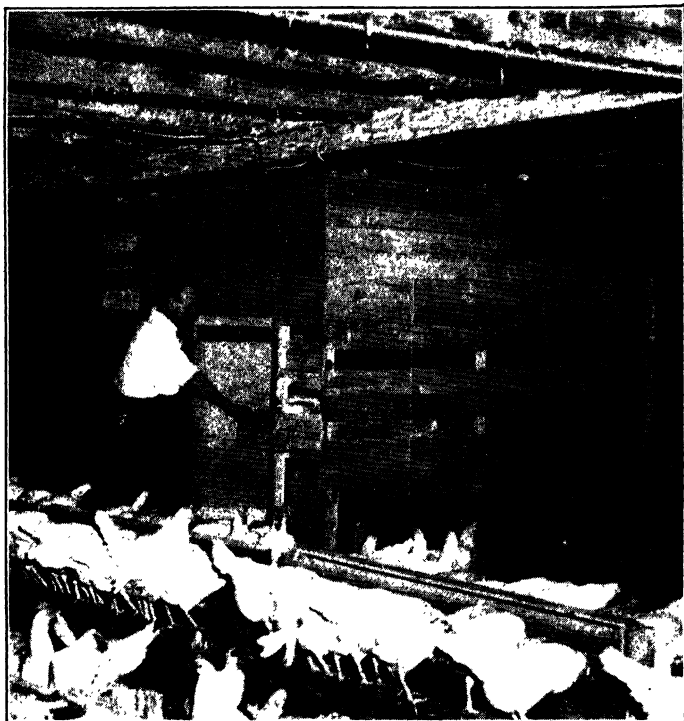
The completed nesting room 8' \times 7' with two units three nests high. Note the sliding entrance door which can be raised or lowered from inside. Note also the opening on two sides at the ceiling, providing air circulation.
